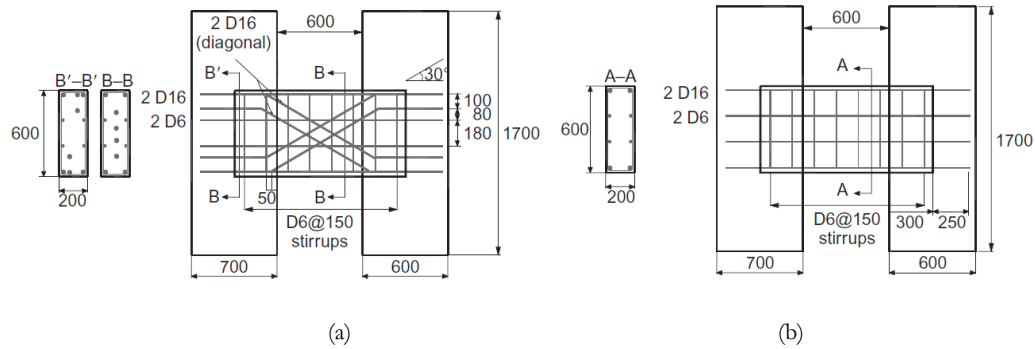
Specimen geometries and reinforcement details (unit mm): (a) (CB1) and (CB2) specimens; and (b) (CB3) specimen [Yun et al., 2008]
